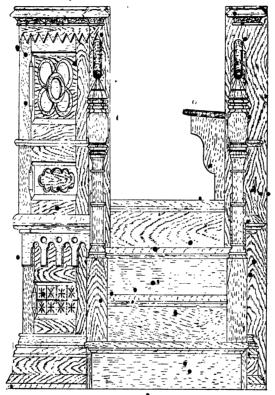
Side Elevation of Pulpit (above Church Floor).
